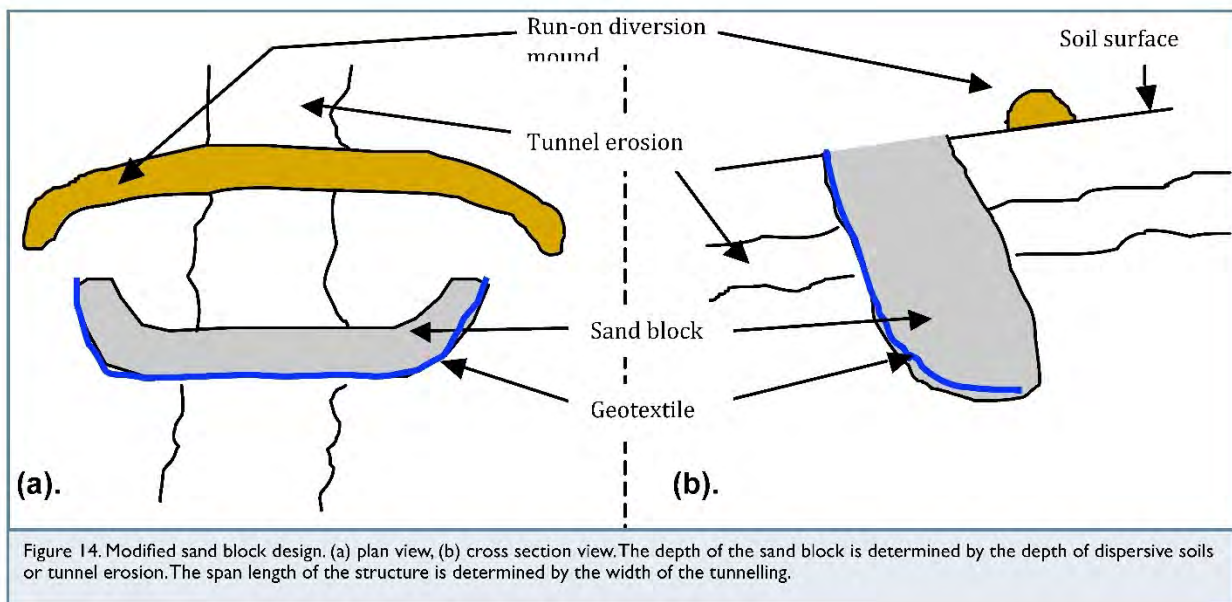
Modified sand block design. (a) plan view, (b) cross section view. The depth of the sand block is determined by the depth of dispersive soils or tunnel erosion. The span length of the structure is determined by the width of the tunnelling.
